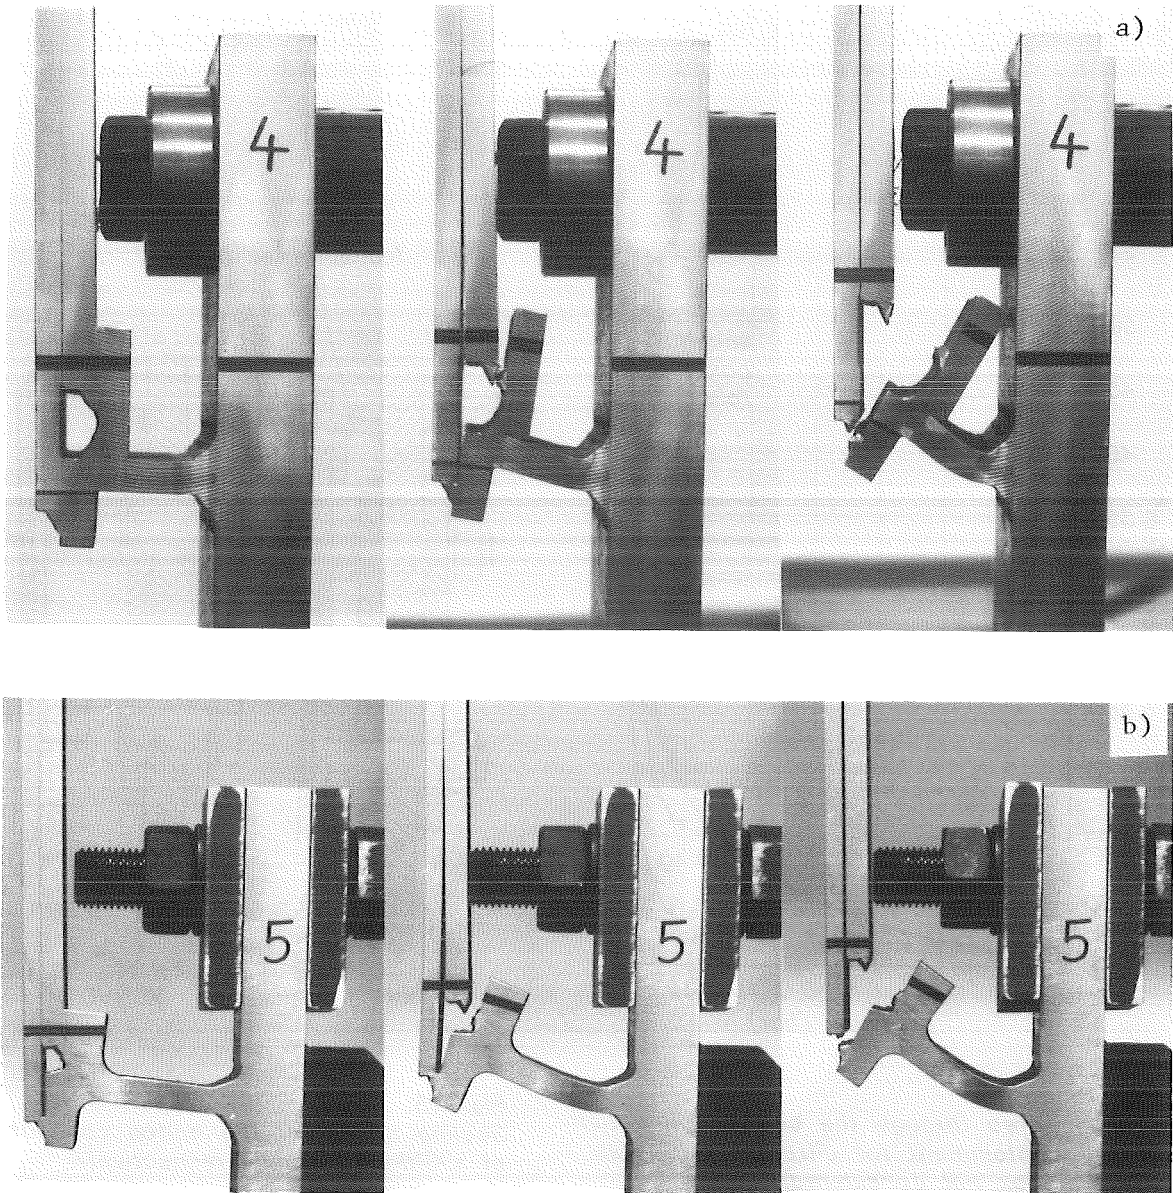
Uniaxial tension tests with strips of the sealing boxes
